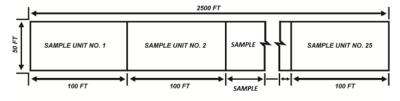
Example Division of a Flexible Pavement Section into Sample Units
